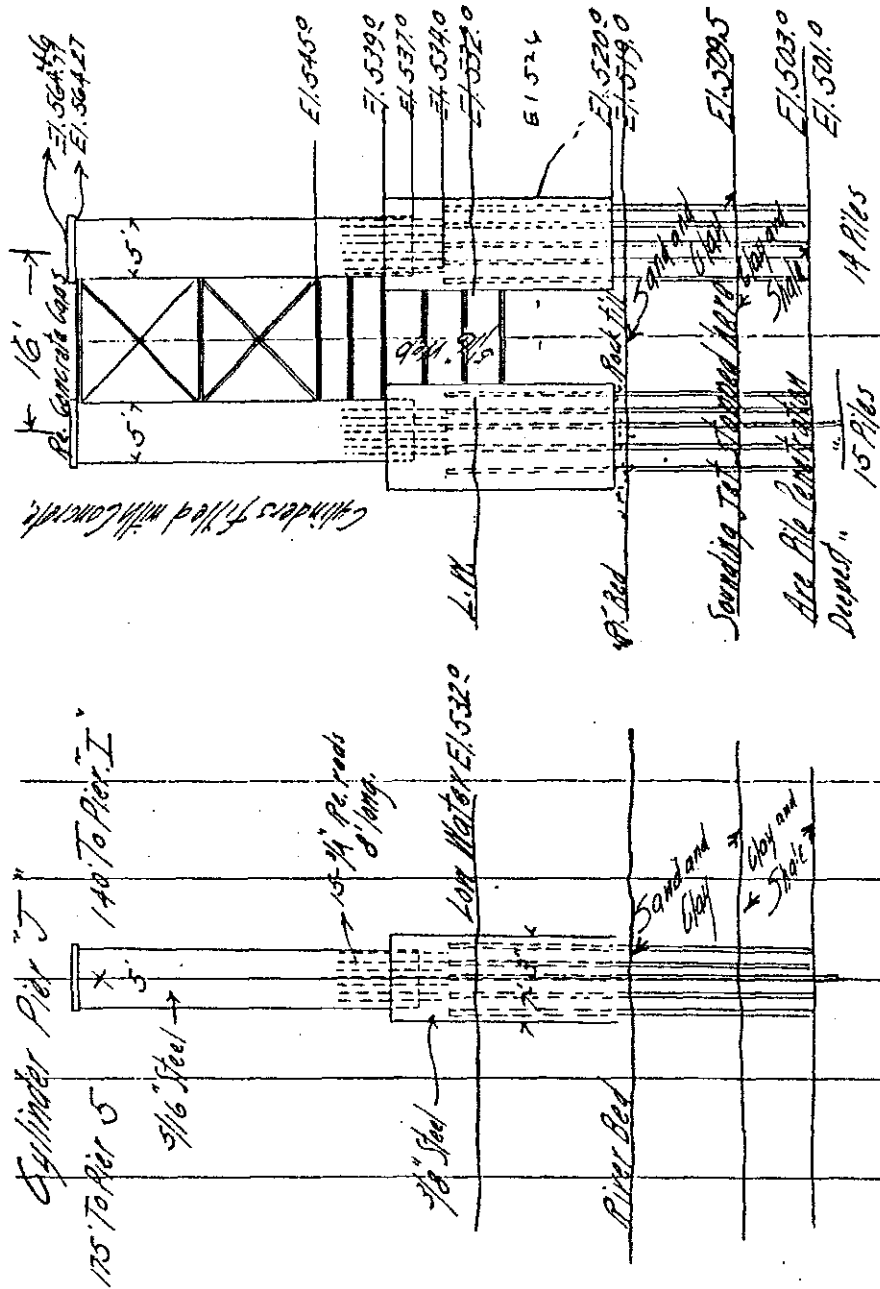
(taken from "Record of Piles Driven for Foundation of Piers and Abutments In the Burlington Bridge Built for the Citizens Bridge Co., Burlington Iowa, 1916," in possession of MacArthur Coffin, Burlington, Iowa.)
